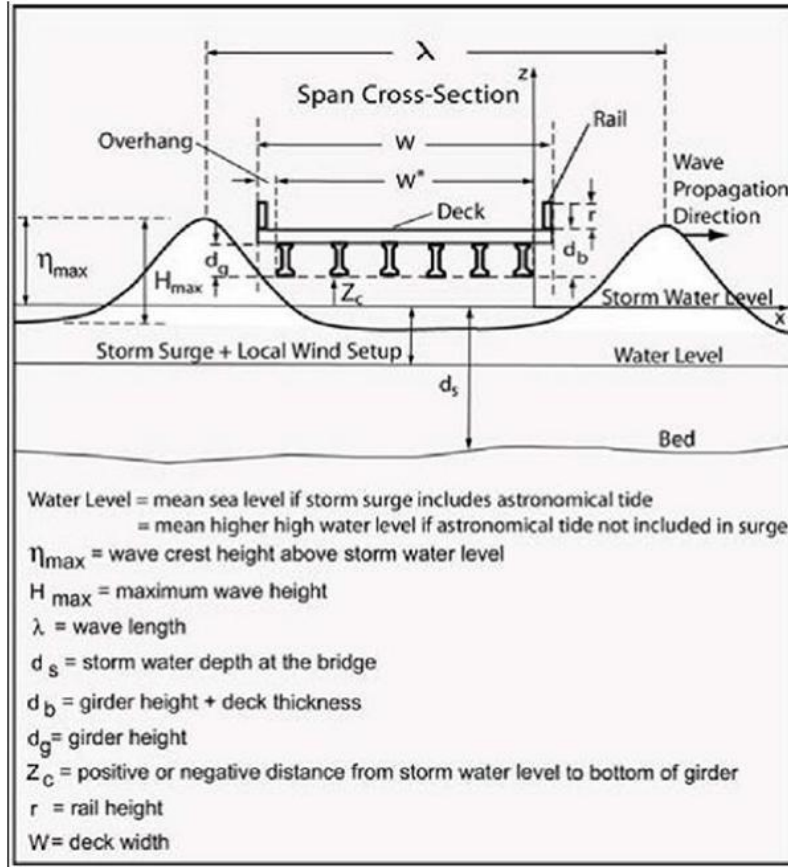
Force components during storm surge and wave loading a bridge superstructure.
